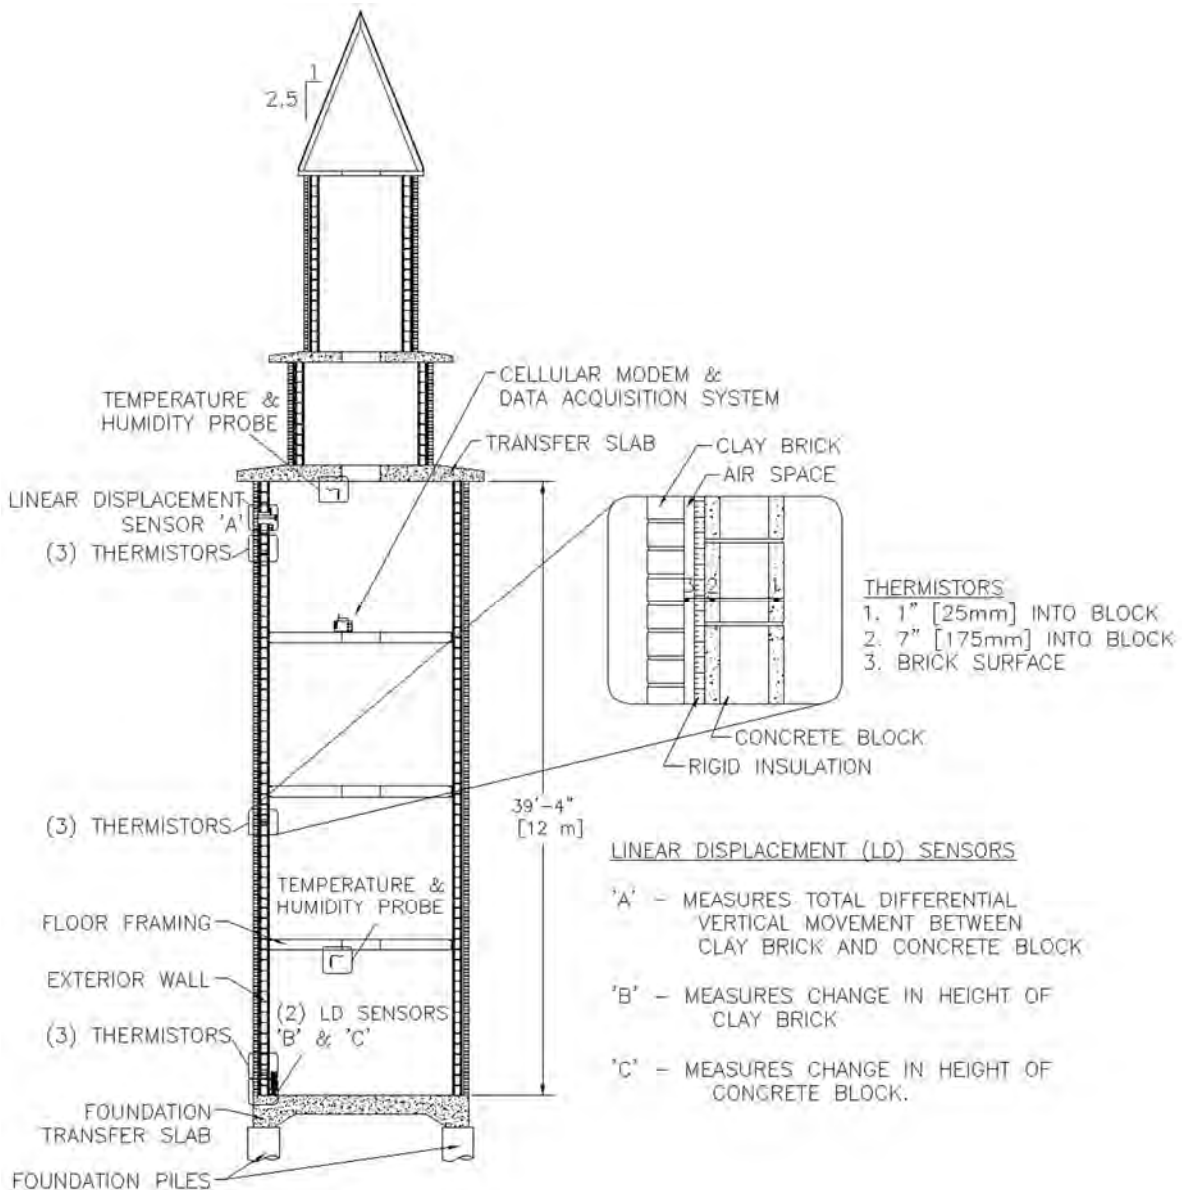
Section View Through the Instrumented St. Albert Clock Tower
